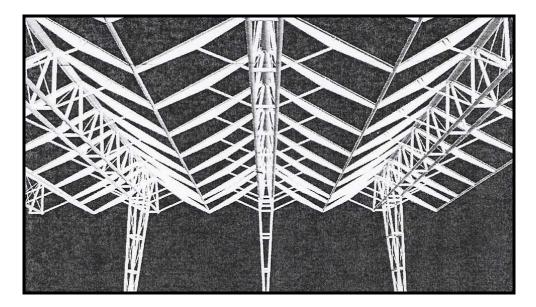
St Andrews Anglican Church (Australian Government Forest and Wood Products Research and Development Corporation, document on-line).
